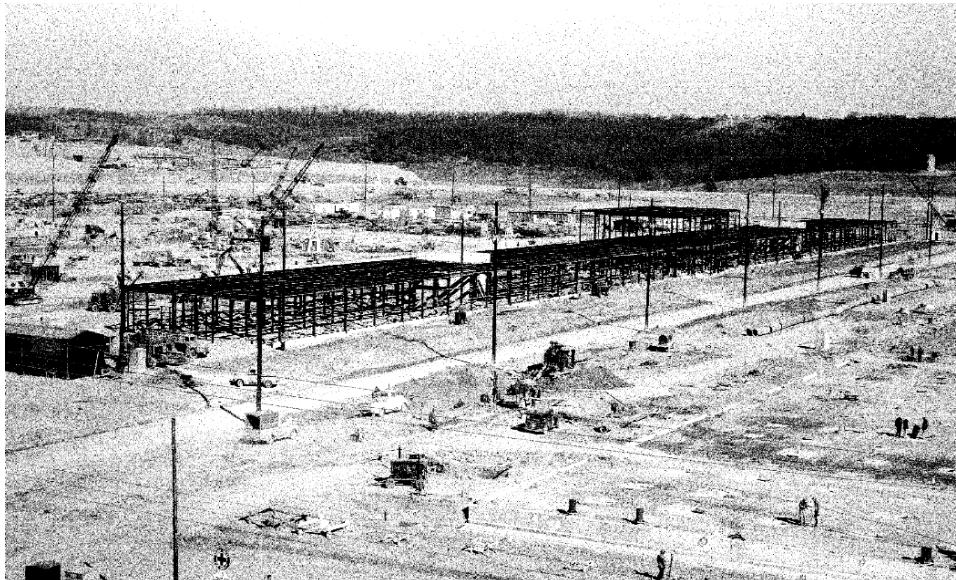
Former X-533 Electrical Switchyard Complex under Construction Looking Northeast (1954)
